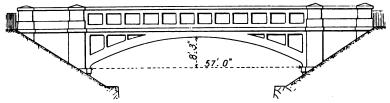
Road Bridge at Farnworth. Cheshire Lines Committee.
